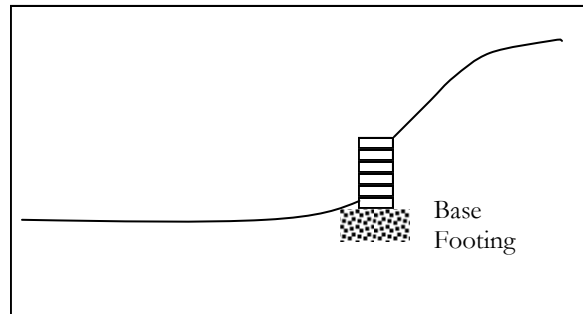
B. Mortared walls require significant footings below grade to maintain vertical position. Additional support provided by anchoring into slope for increased height and use in unstable soils.
